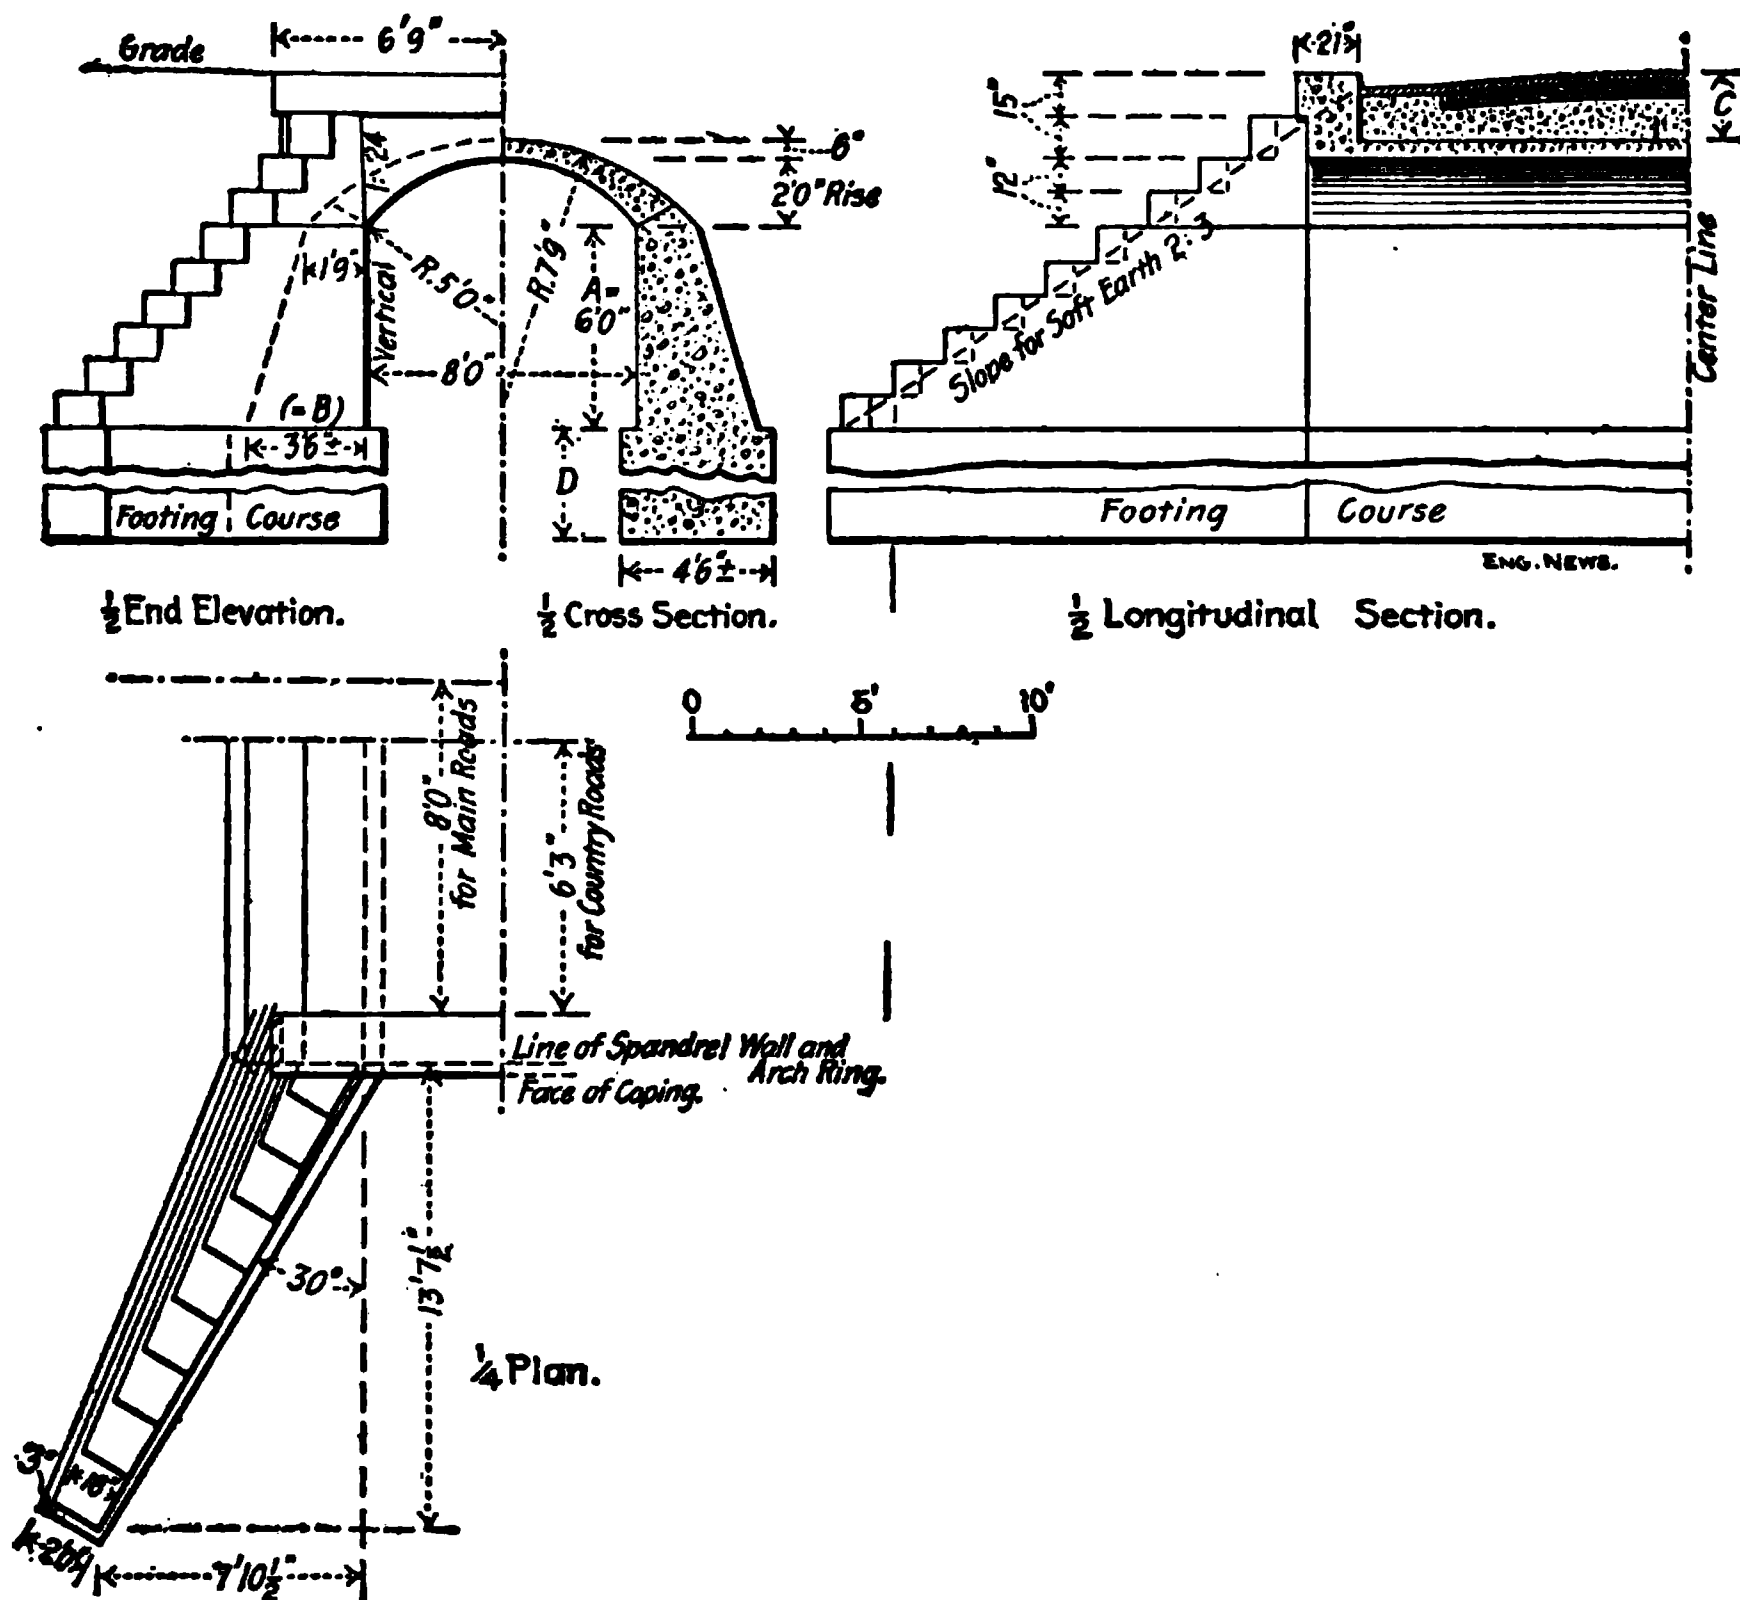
PLANS OF EIGHT-FOOT PLAIN CONCRETE HIGHWAY CULVERT, PORTO RICO.
